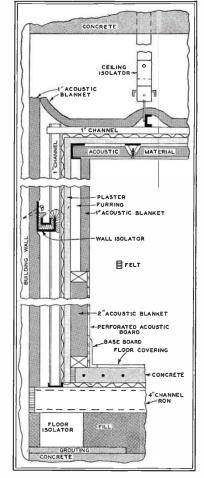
WPIX STUDIO WALL, CEILING, AND FLOOR CROSS-SECTION SHOWS THAT ALL ELEMENTS OF THE STUDIO ARE ISOLATED FROM OUTER SHELL
